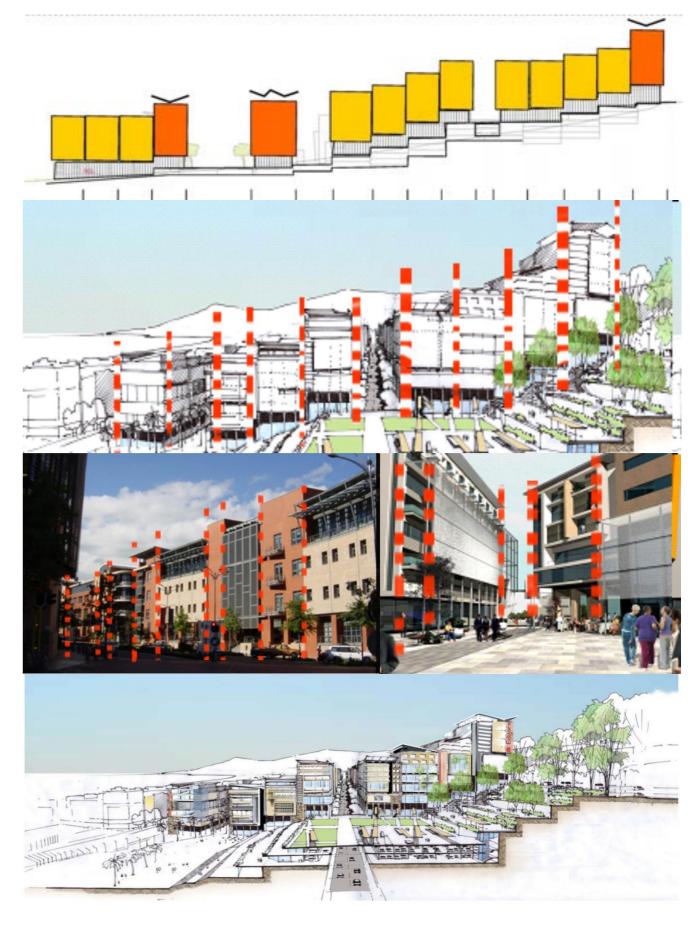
3 Design Exploration & Examples demonstrating Vertical Façade Modulation
